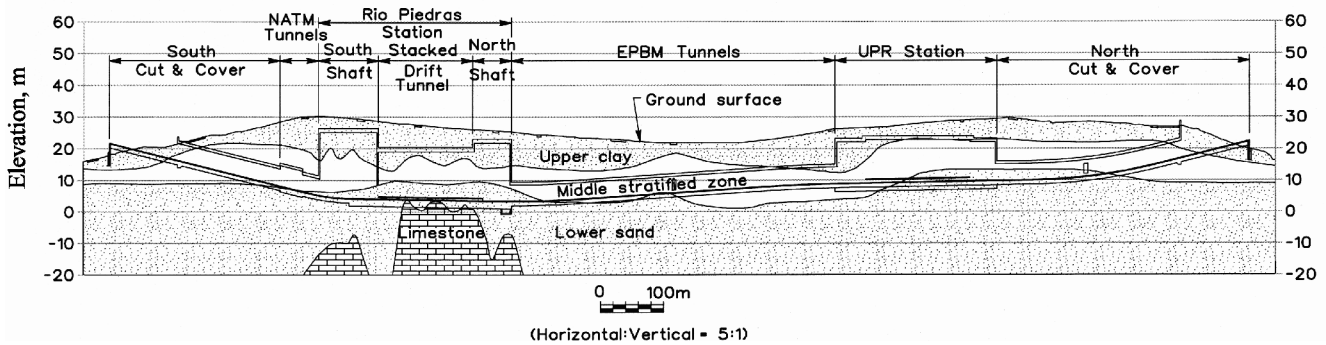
Underground Section of Tren Urbano, Río Piedras Contract
